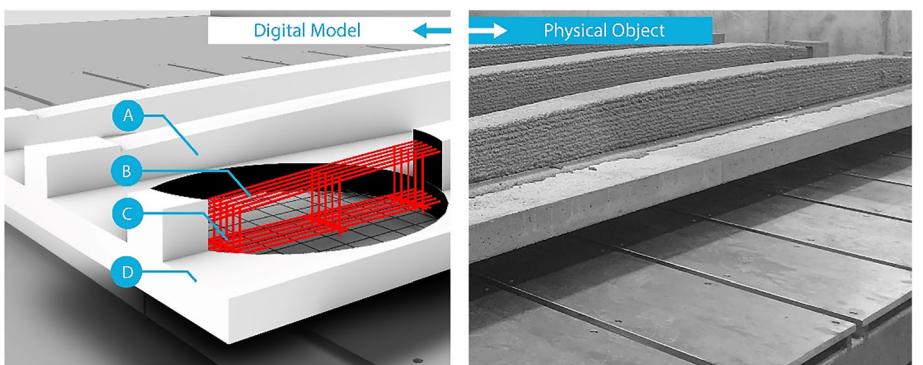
Printing the concrete cover of the tensile reinforcement. Source: Institute of Structural Design
